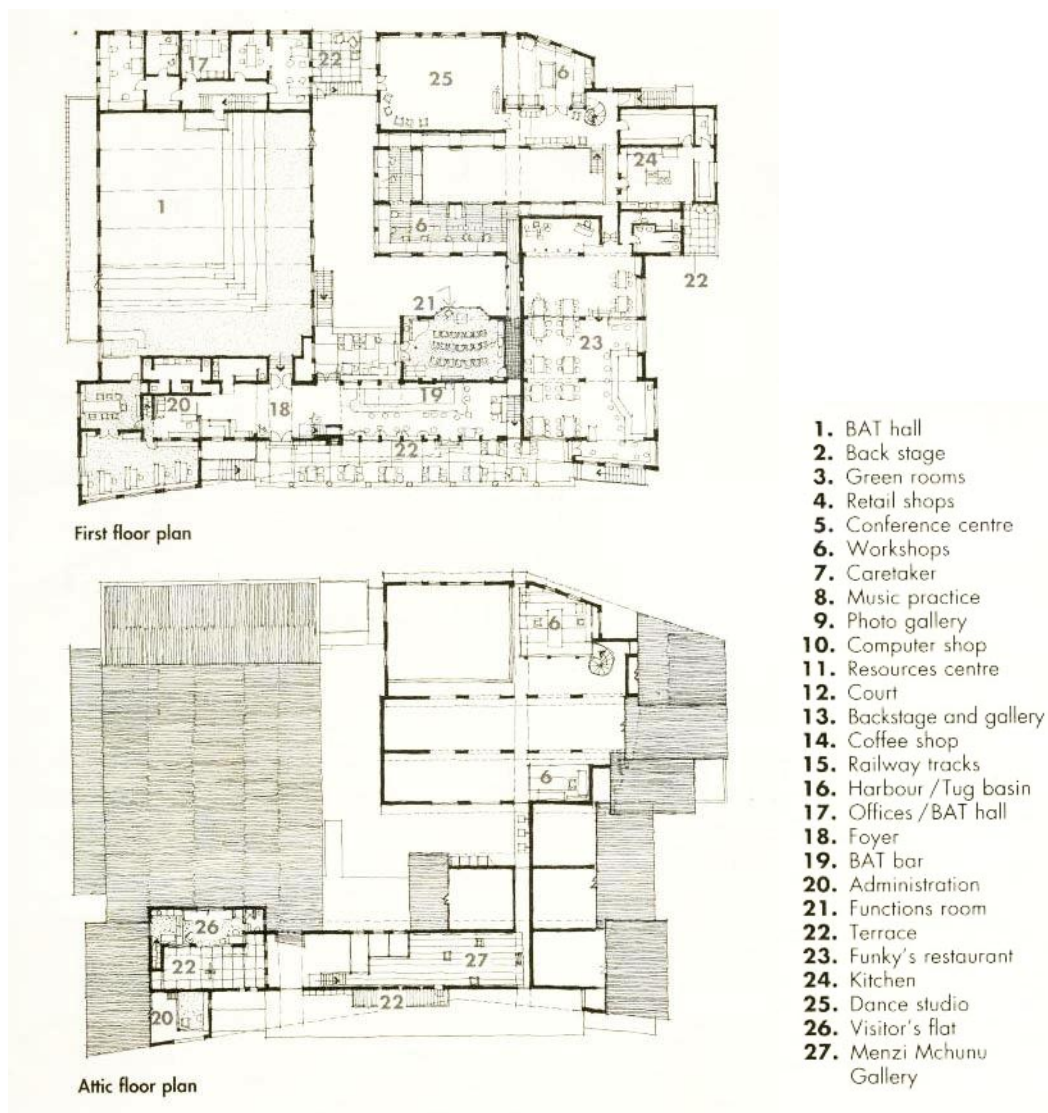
Upper Floor Plans of the BAT Centre (1996)
